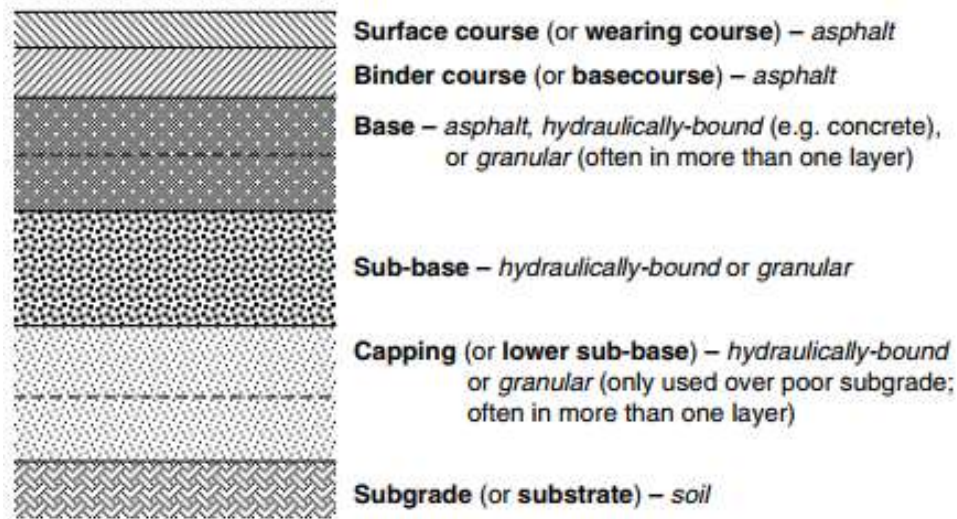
Schematic of a Flexible Pavement layer (Source: Principles of Pavement Engineering, 2008)
